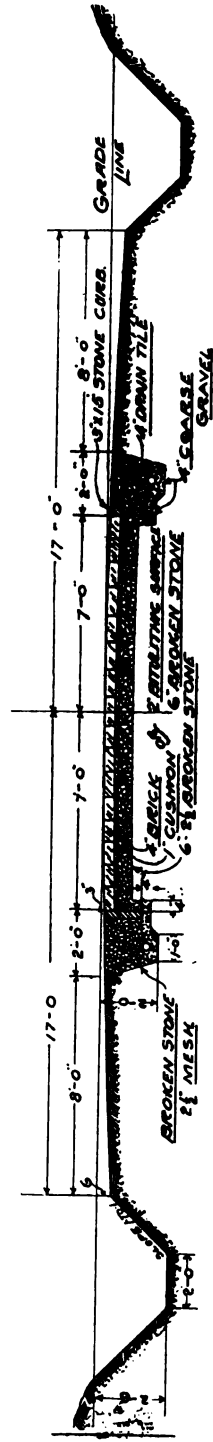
Proposed cross section State Road No. 3, Parma and Royalton, April, 1905. Wm. H. Evers, C. E., County Engineer.
